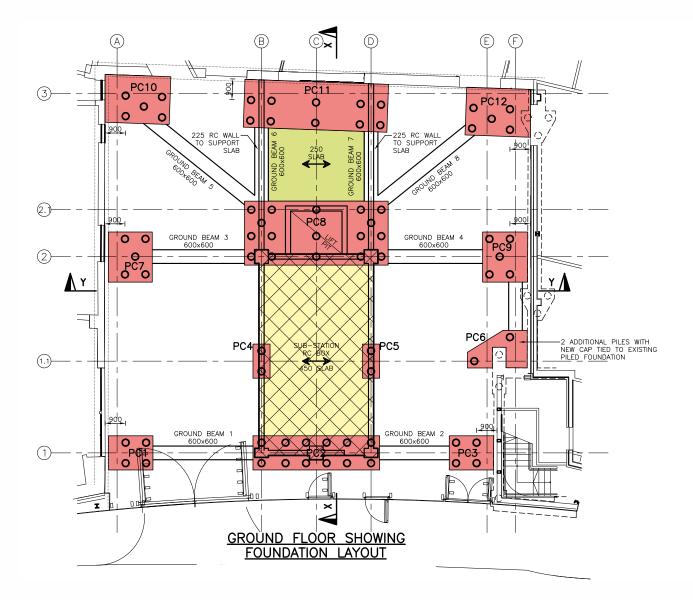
Proposed foundation layout (Chamberlain Consulting, dwg 14061–P01, rev T1, February 2015)
